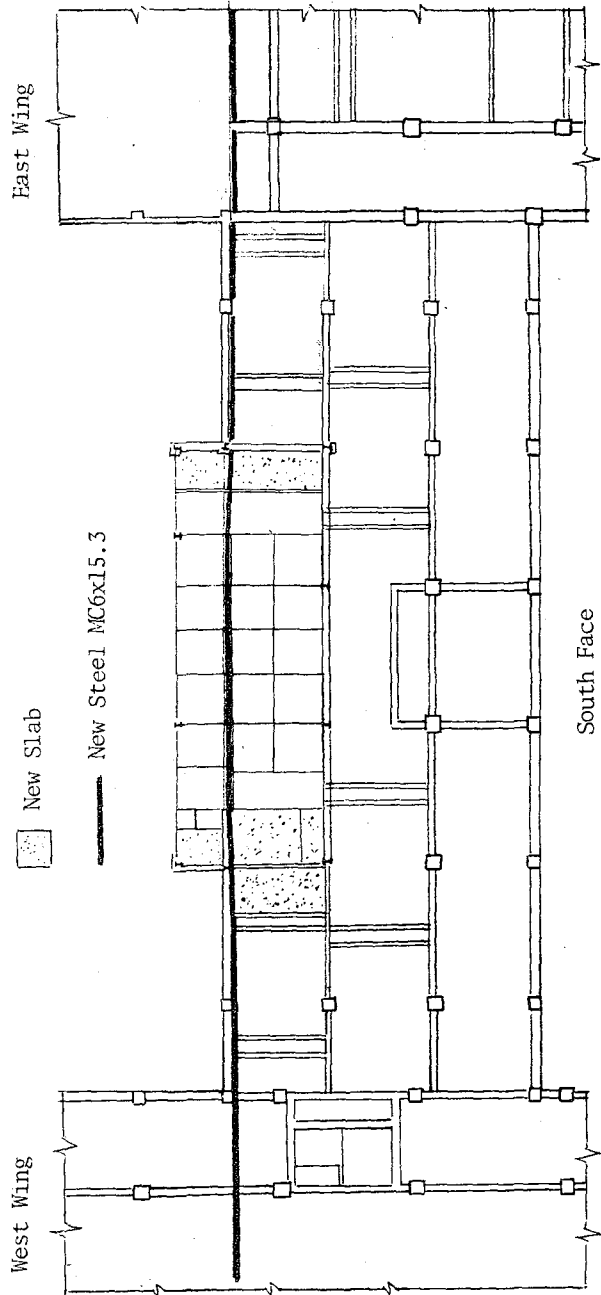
(d) NEW TIE FOR FLOOR DIAPHRAGMS FLOOR 3 THROUGH 11
